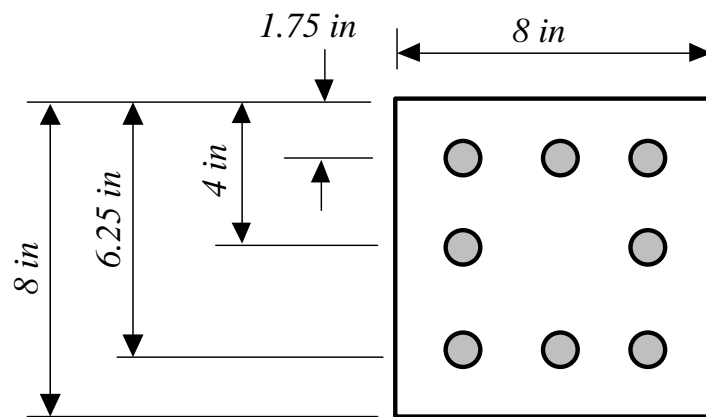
cross-section dimension and reinforcement arrangement in the column specimens
